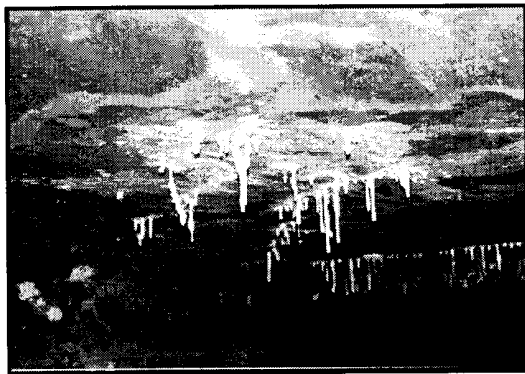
Severe stalactites and lime stains at deck soffit due to water leaking through cracks at deck slab
